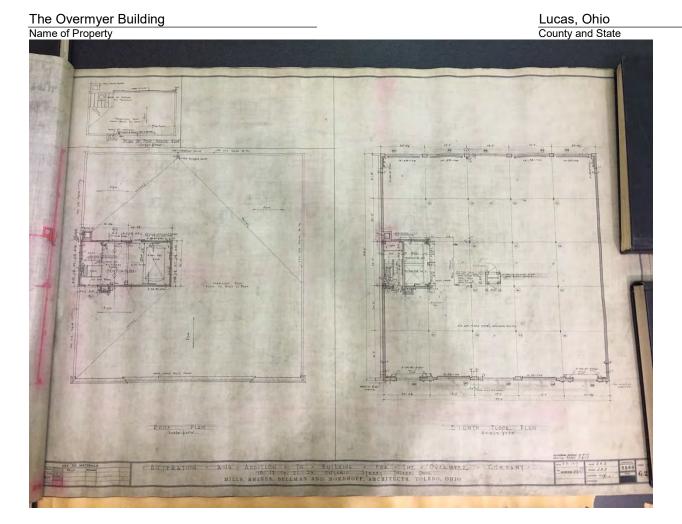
B. Vertical Addition Eighth Floor and Roof Plans
